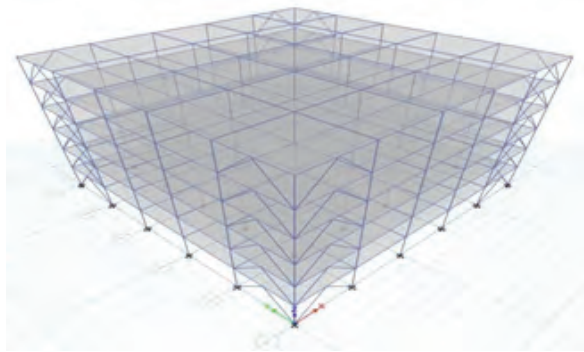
3D model of G+5 storey building with inverted-V pattern BRBs at the corners of building
